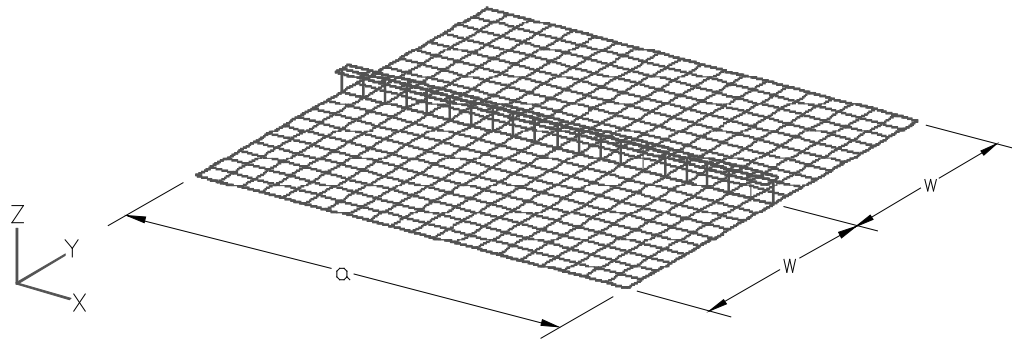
Undeformed Shape of Typical Compression Flange
